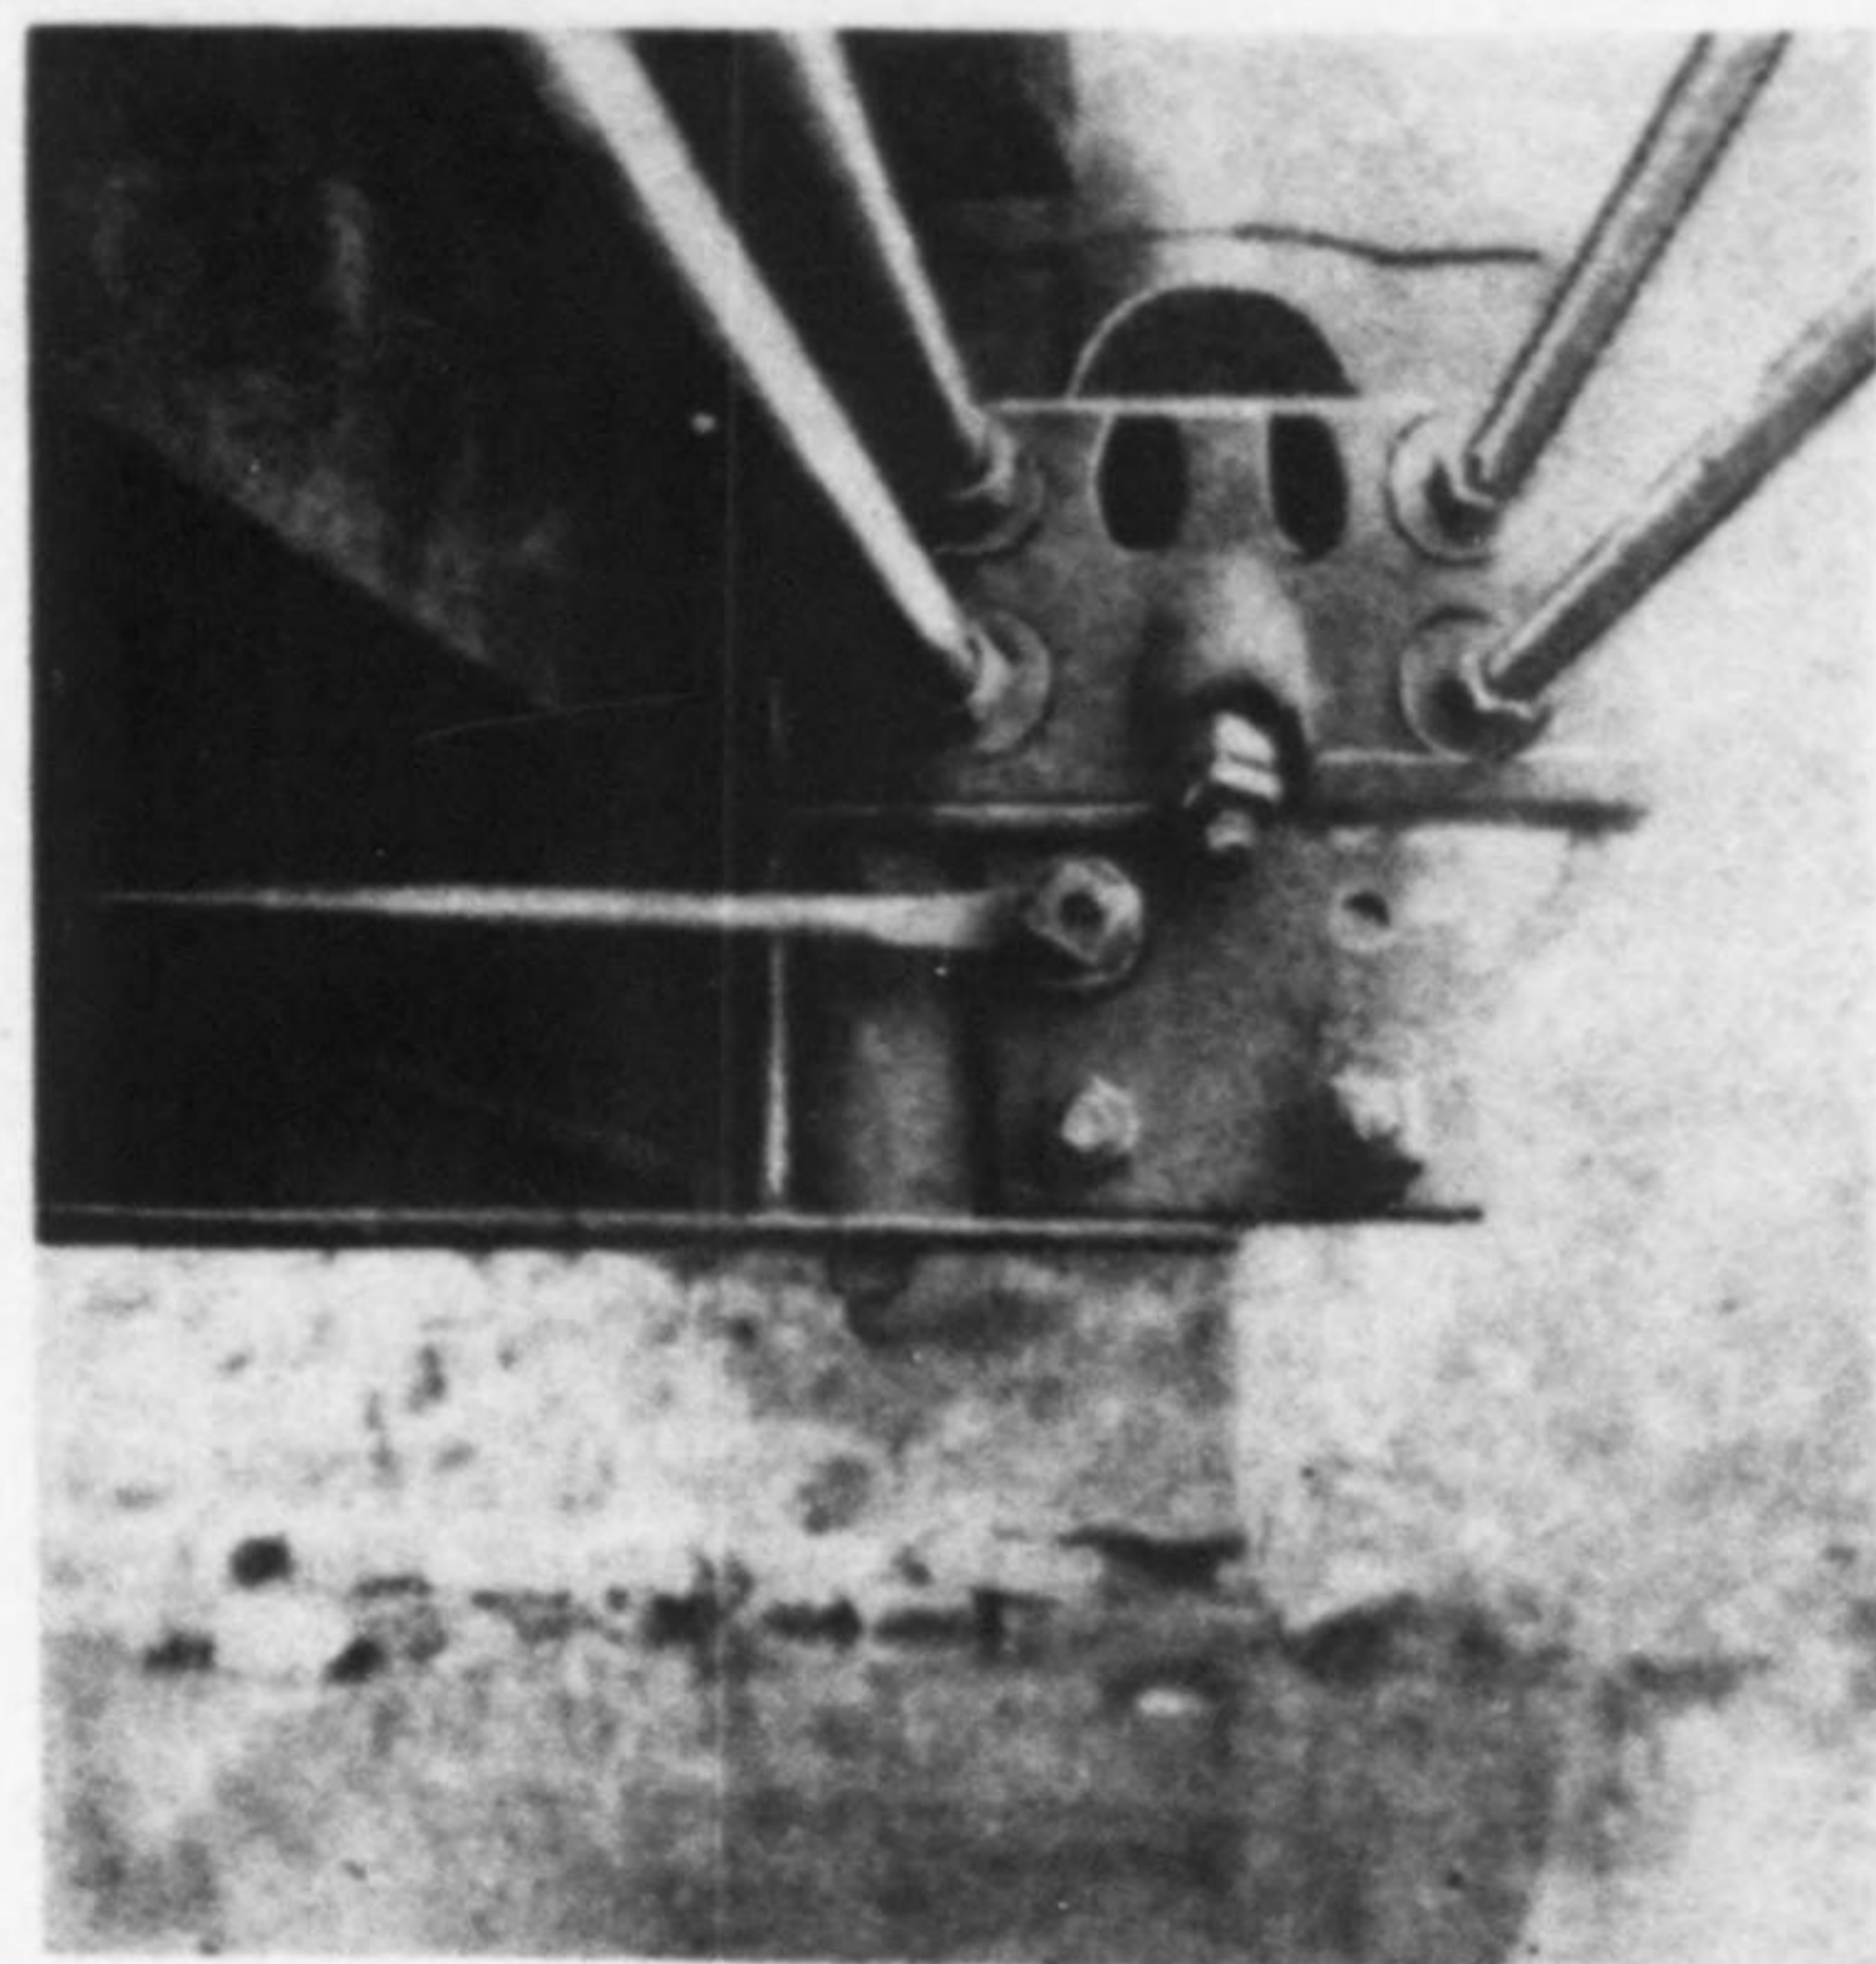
Bottom panel-point casting on Hellertown bridge providing connection for diagonals, chords and floor beams.
